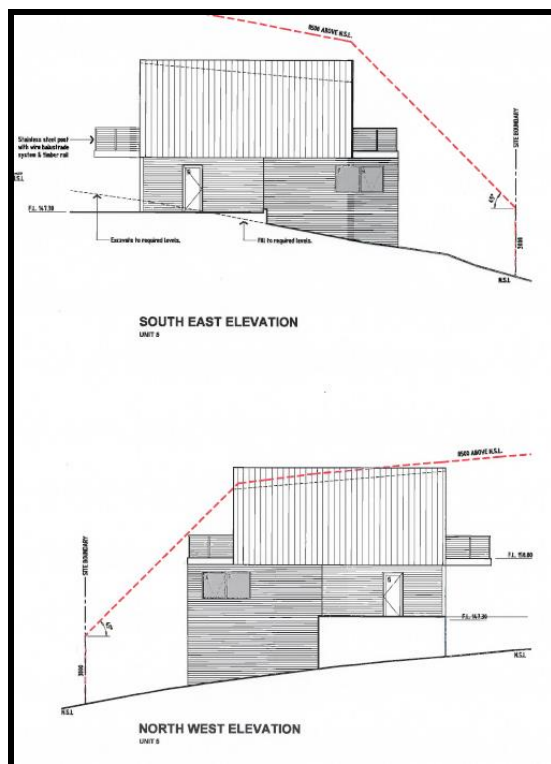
A snapshot of proposed dwelling 5, showing the dwelling extending outside the building envelope (marked in red) as prescribed in acceptable solution A3.
